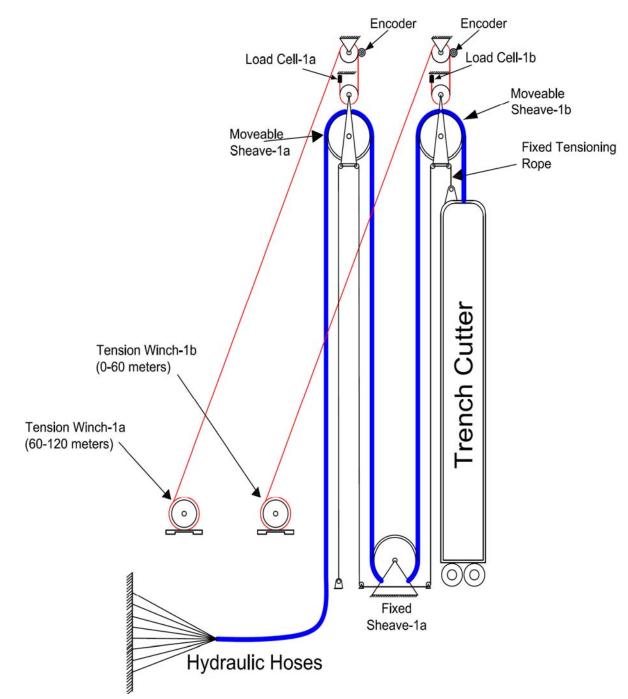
Schematic showing how Hydraulic hoses, Tension winches, Cutter, Sheaves & Wire rope are inter connected
